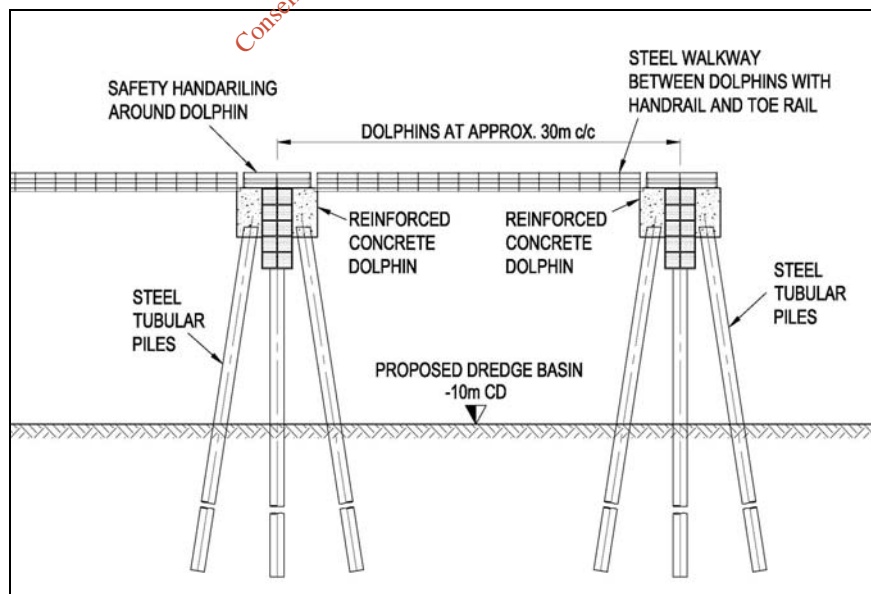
Alexandra Basin Ro-Ro Jetty Form of Construction
